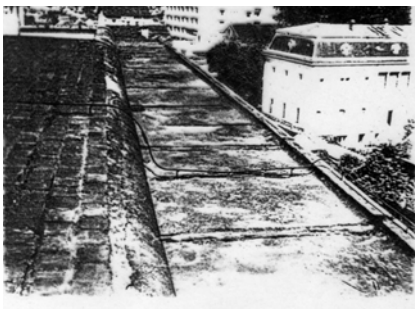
Cracks in concrete structures situated under action of HHC
